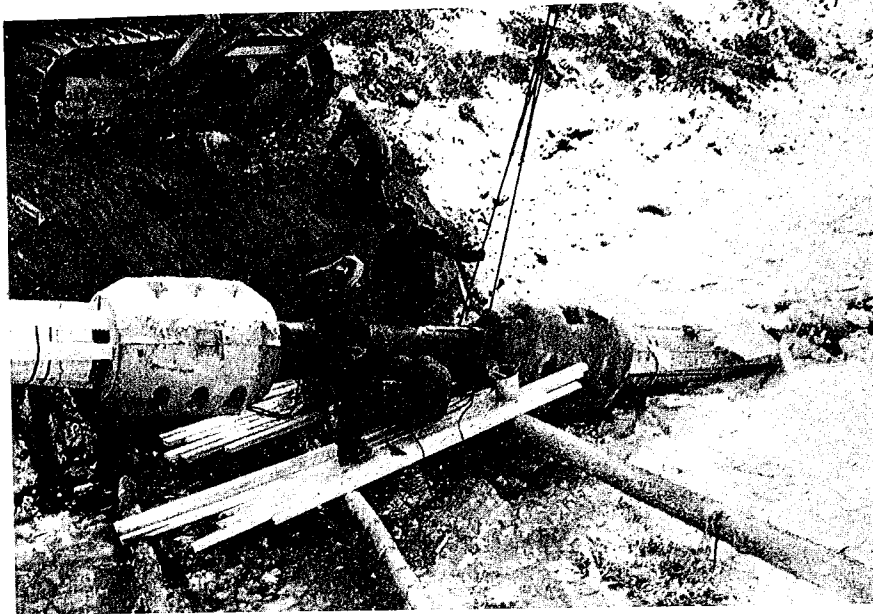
Welding pipe together on the Kotaneelee River pipeline crossing.
